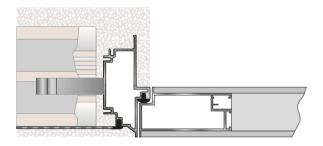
MOUNTING OF PIU FRAME IN MASONRY WALL
